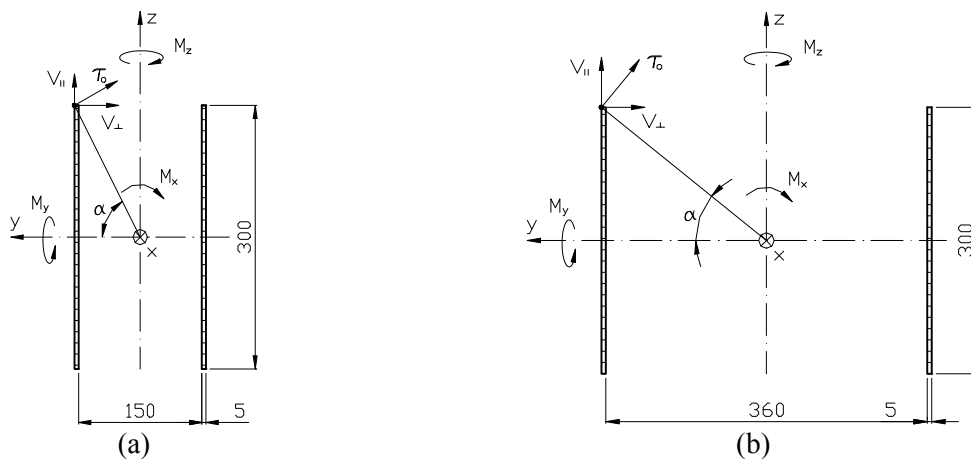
(a) Welded joint between the flange of IPE 300 and the horizontal girder of the temporary support (welded joint "A" in Fig. 10); (b) Welded joint between the flange of IPE 360 and the horizontal girder of the temporary support (welded joint "B" in Fig. 10)
